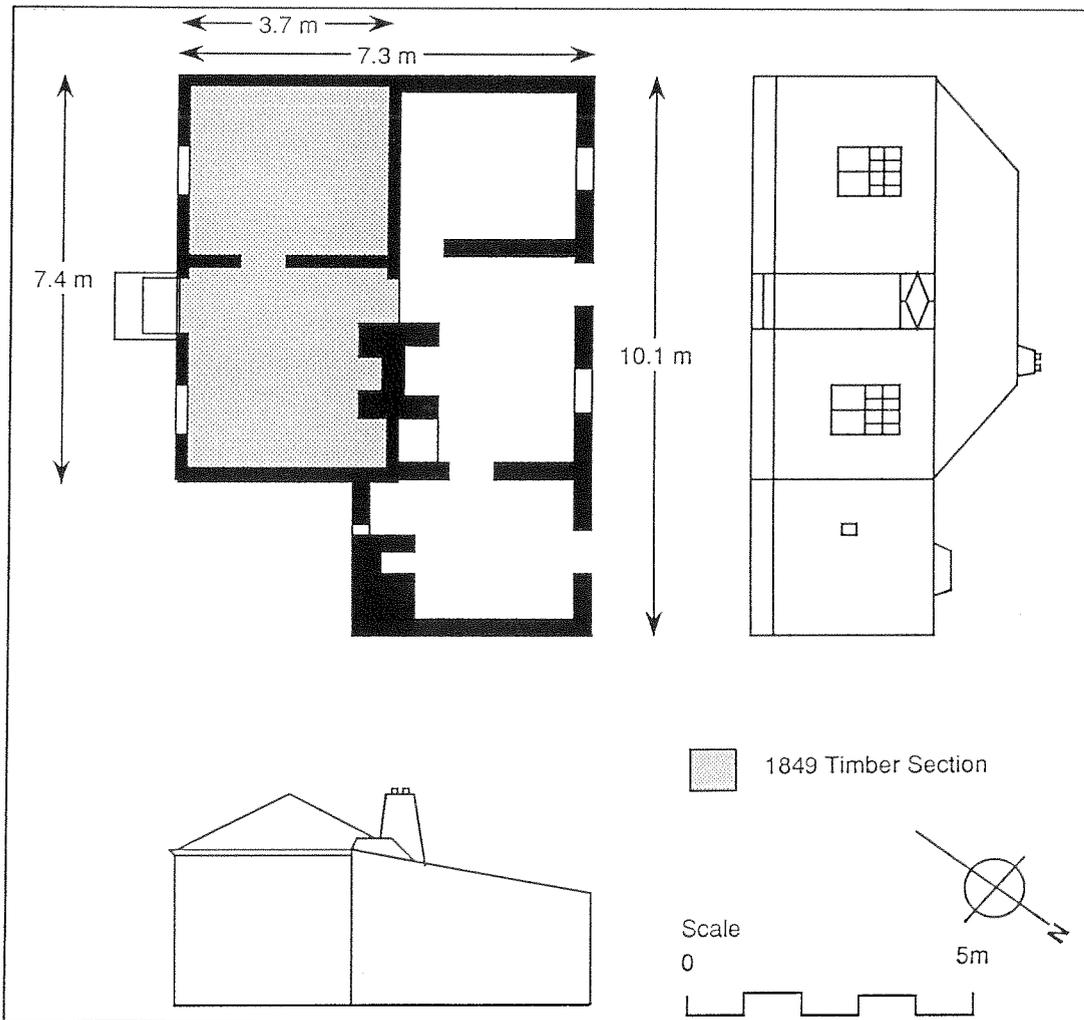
Timber Cottage, 39 Commercial Street, Burra. Shaded area is 1849 timber section.
